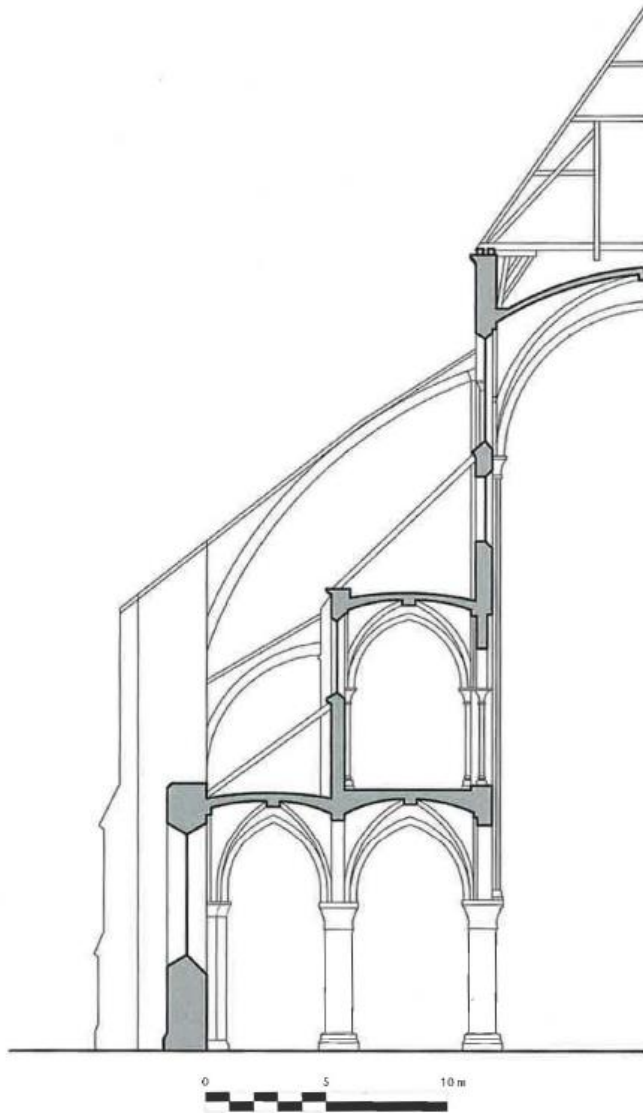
Paris, Notre-Dame, reconstruction section through S6, showing vaults through S5
